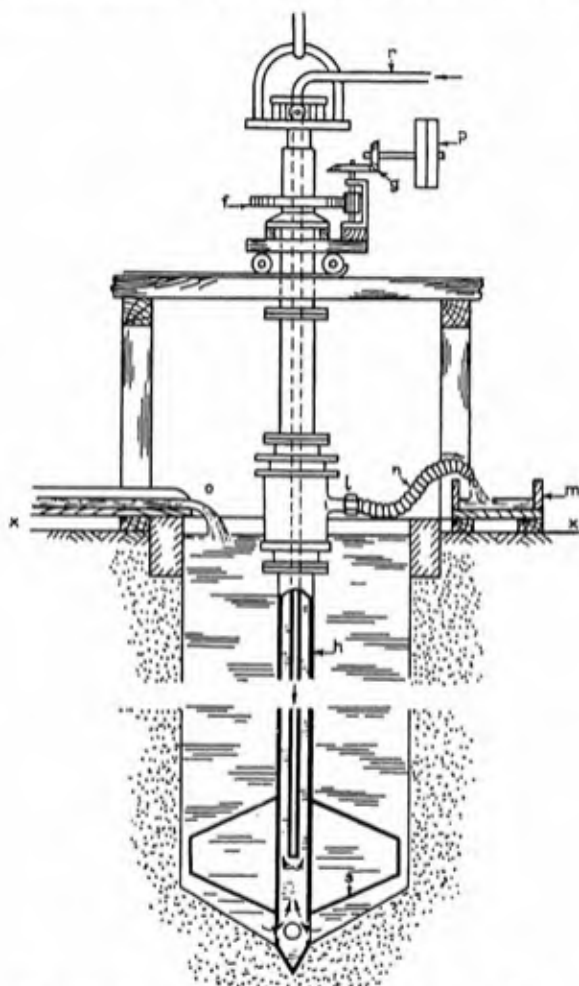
HONIGMANN METHOD OF BORING OUT A SHAFT
